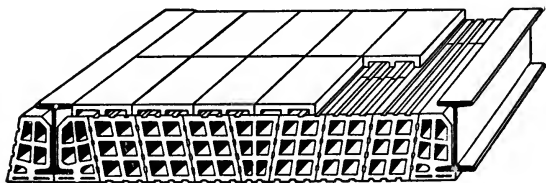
Side-construction Terra-cotta Arch. Bevelled Joints.
